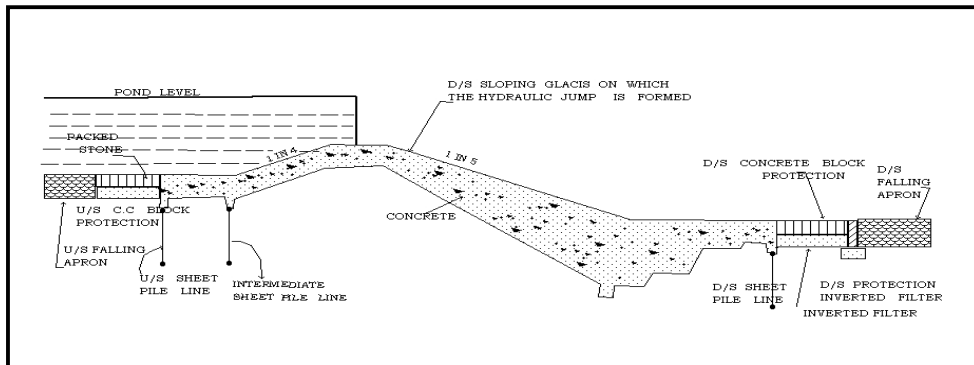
(c) Typical Cross-section of a Modern Concrete Weir with Permeable Foundation.
